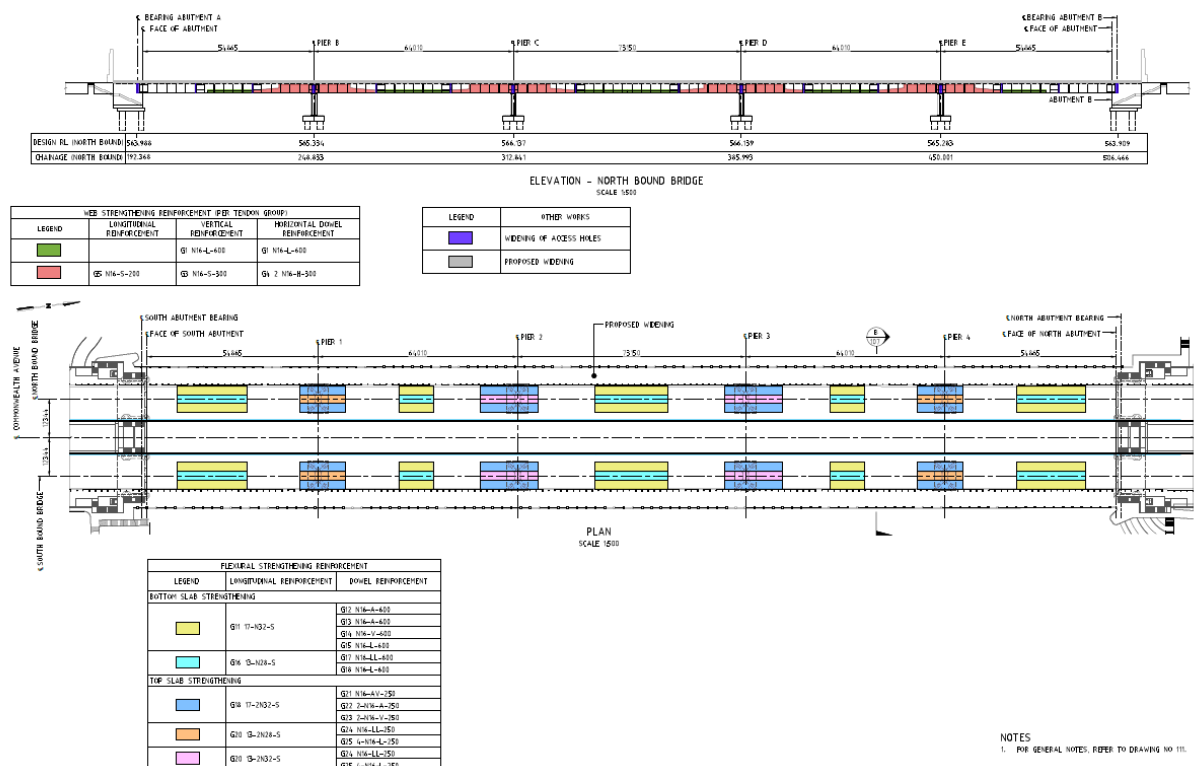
Proposed strengthening of Commonwealth Avenue Bridge
